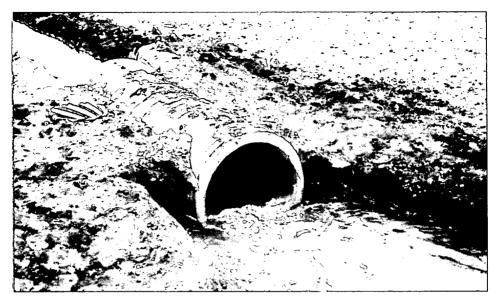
Prefabricated weir constructed in a section of concrete pipe (California).
